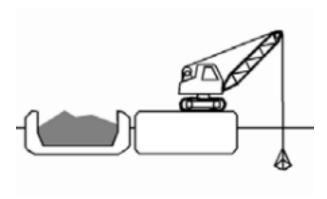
Sketch of a wire crane on a barge (Schiereck and Verhagen, 2019)
